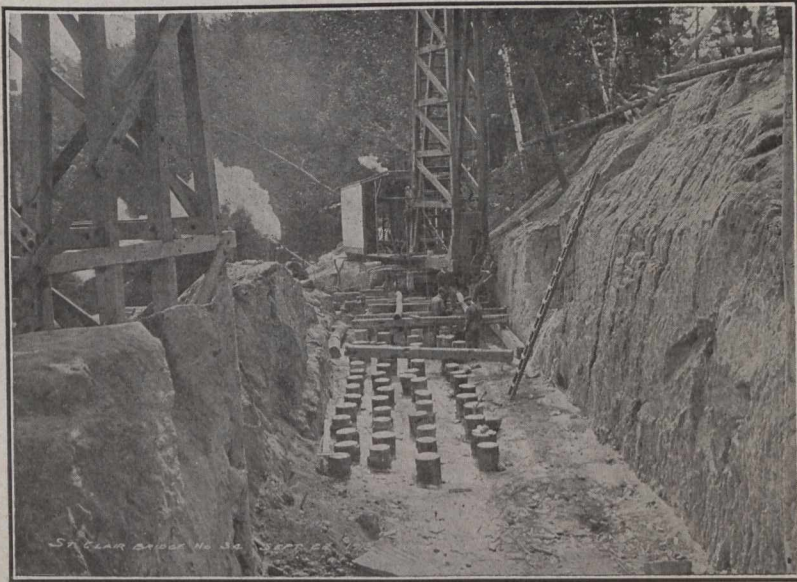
Piling in West Abutment, Showing Piles Cut Off.
